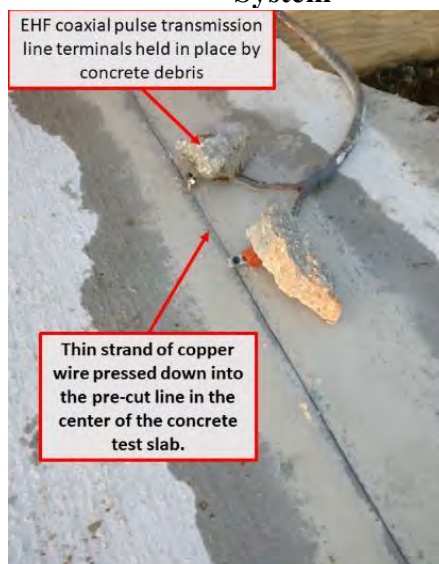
Shot 12: Copper Wire in Slit Line for Exploding Wire Test
